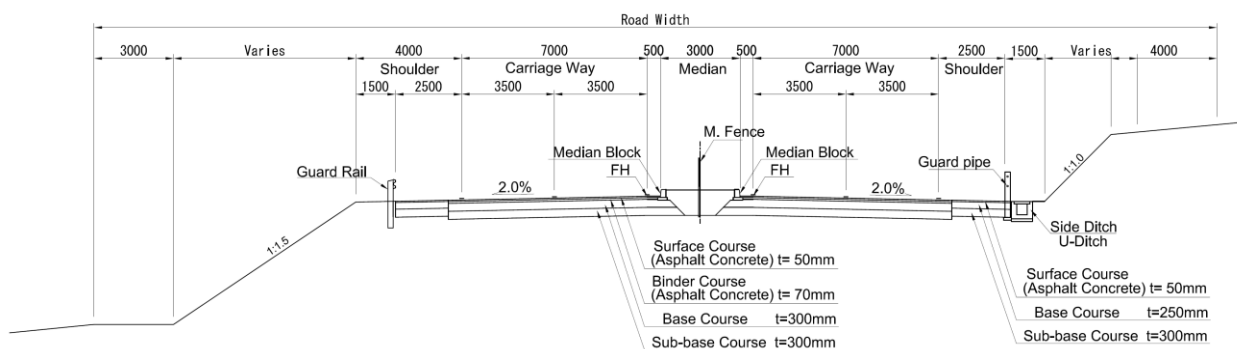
Drainage Facilities at Cut Sections Where Service Tracks are not Provided
